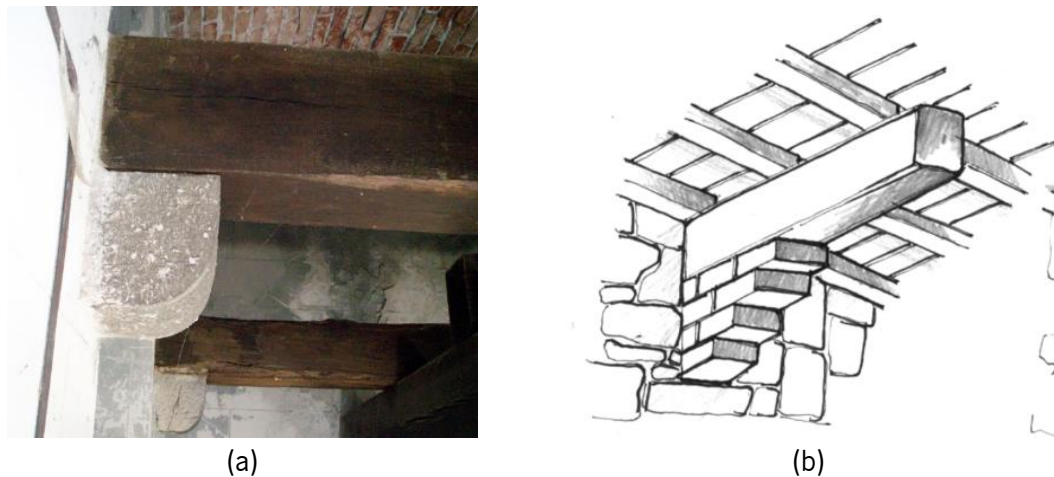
Timber beams on corbels: (a) Connection detail inside Castello d'Albertis, Genova, Italy (Maresta 2018); (b) example of bricks arranged as corbels to support timber beams (Scali 2011).
